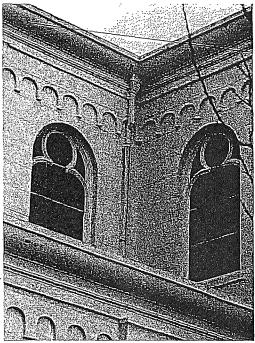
West façade, showing blocked or perforated drainage which is causing damage to interior plaster.
